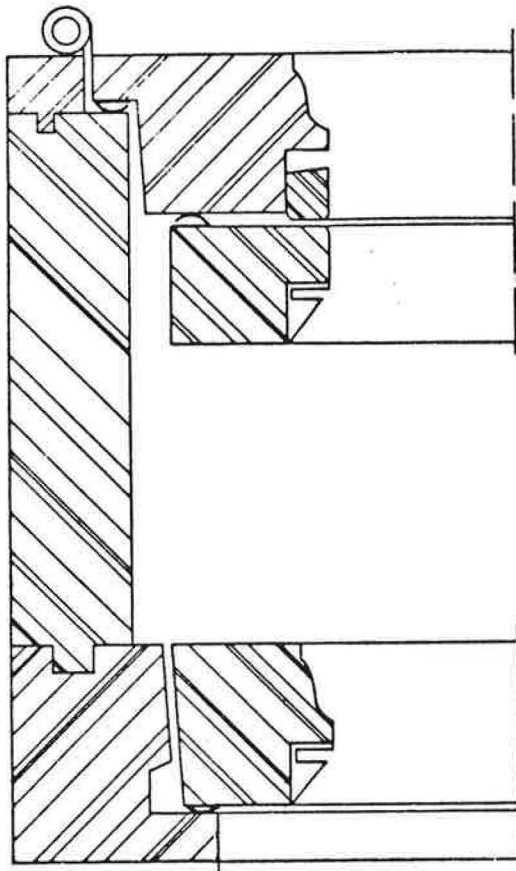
Window frame joints sealing with sealing trip (V-profil). Horizontal section.
